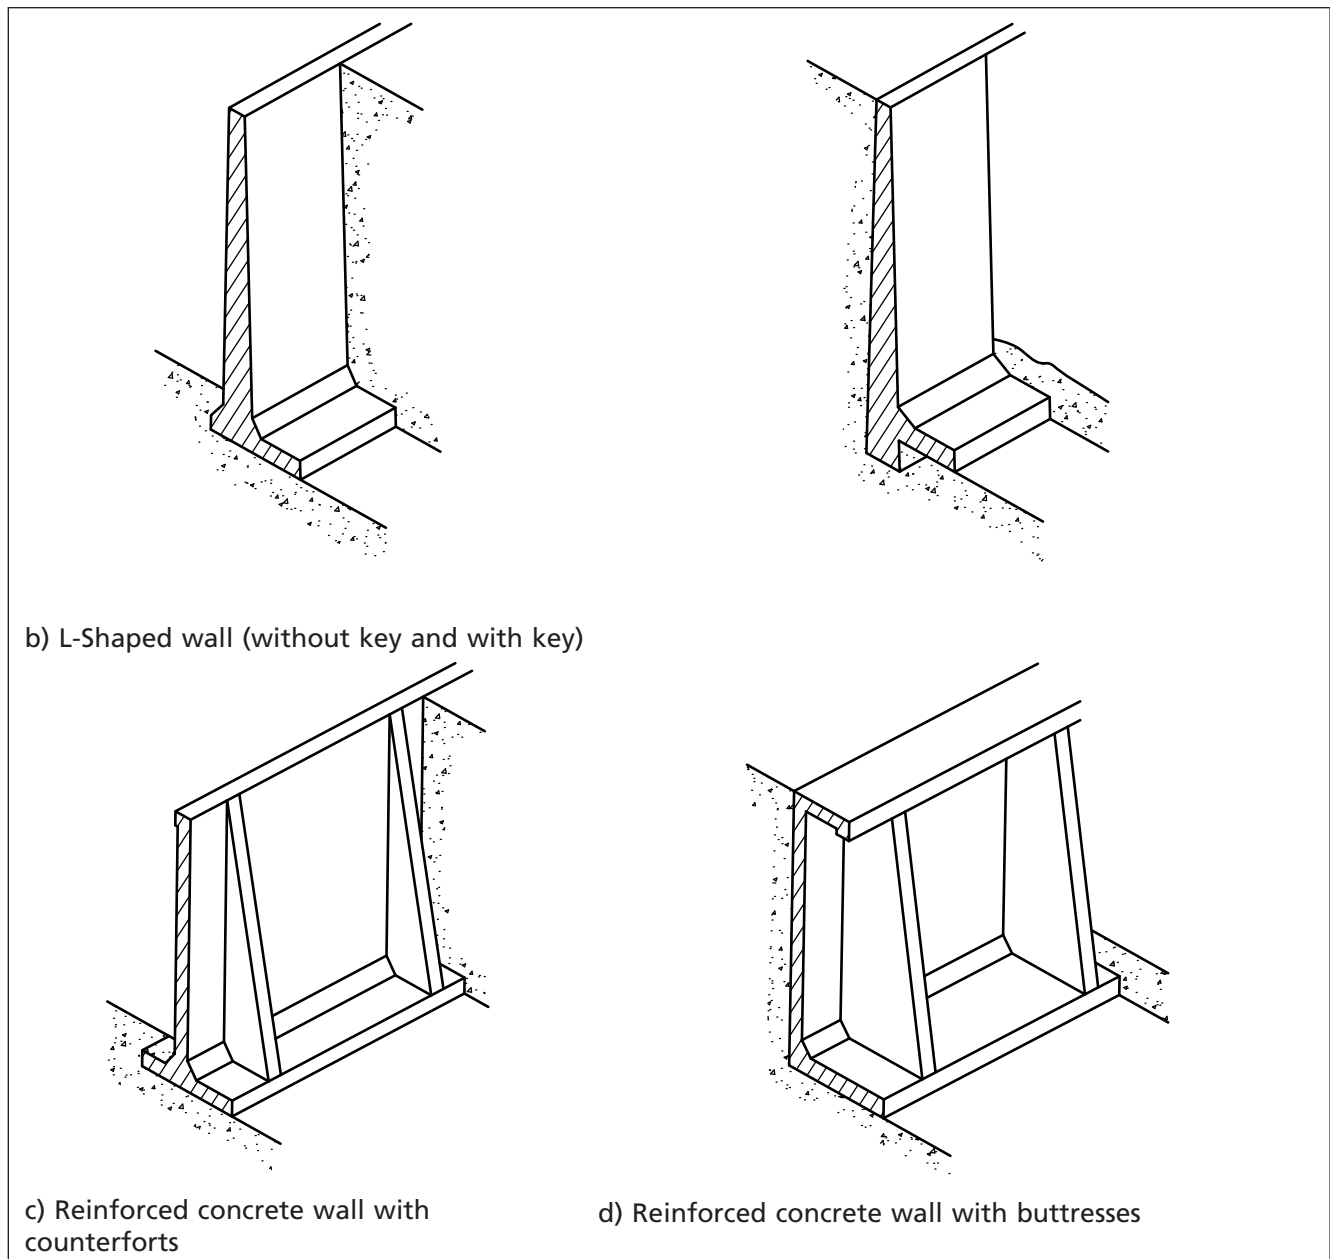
Examples of reinforced concrete retaining walls (2 of 2)
